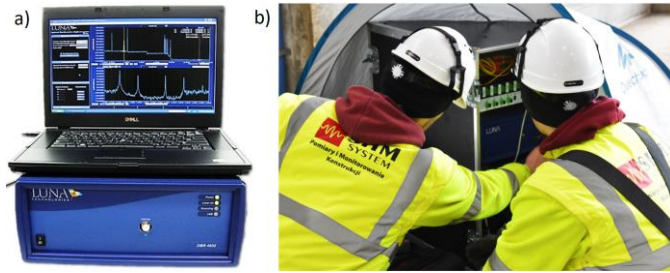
Optical backscatter reflectometer OBR4600: a) general view [27], b) the view during measurements.
